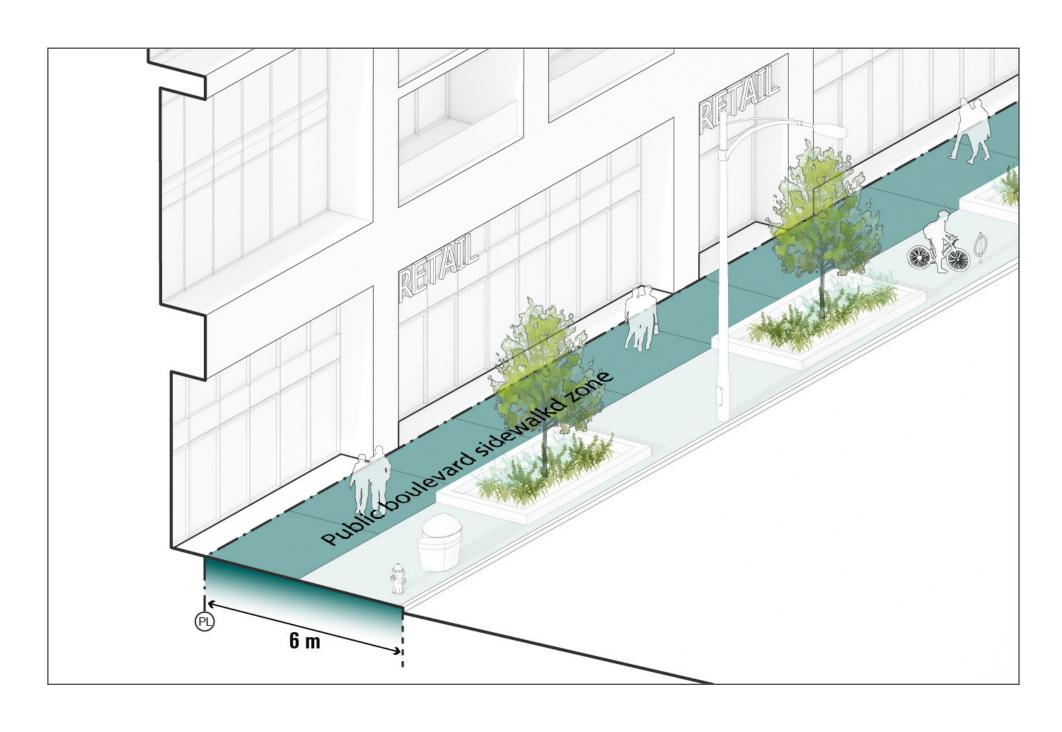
Illustration of commercial frontage with a generous sidewalk zone to support an active frontage and vibrant pedestrian environment.
